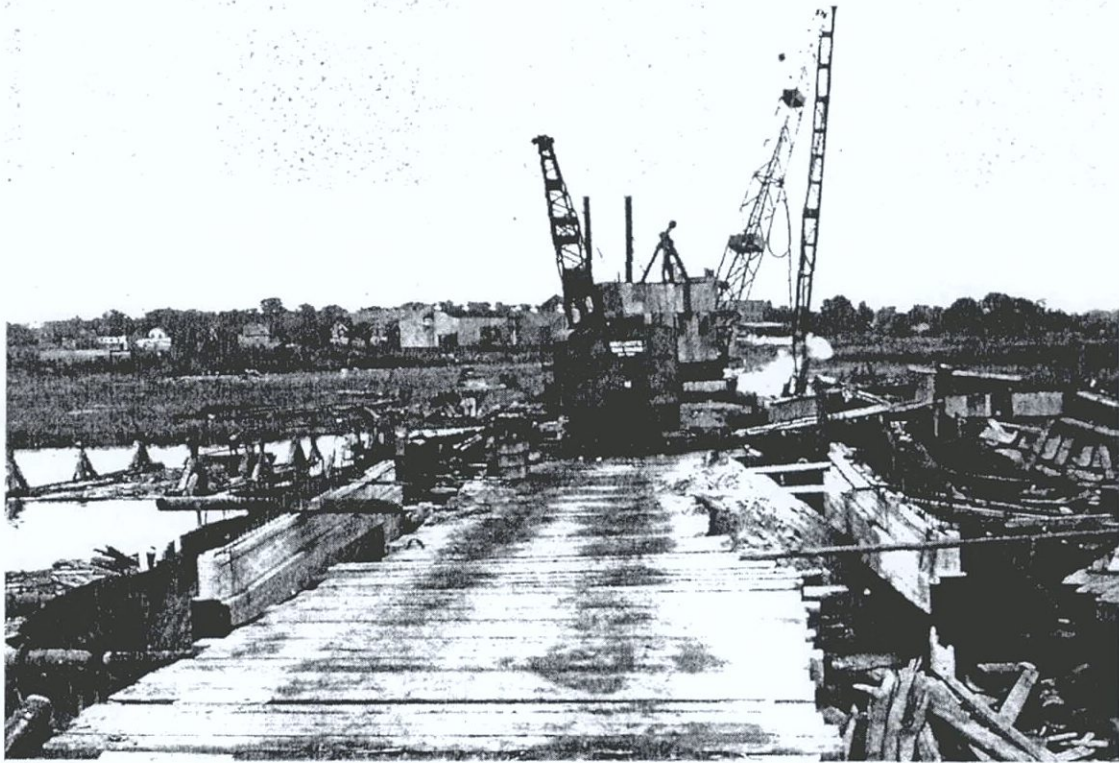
Construction of tide gate and dam. Note elevation above marsh in background. Flushing Bay Ecosystem Restoration Project, Queens County, New York (*Flushing Meadow Improvement, 1937h:45*).
